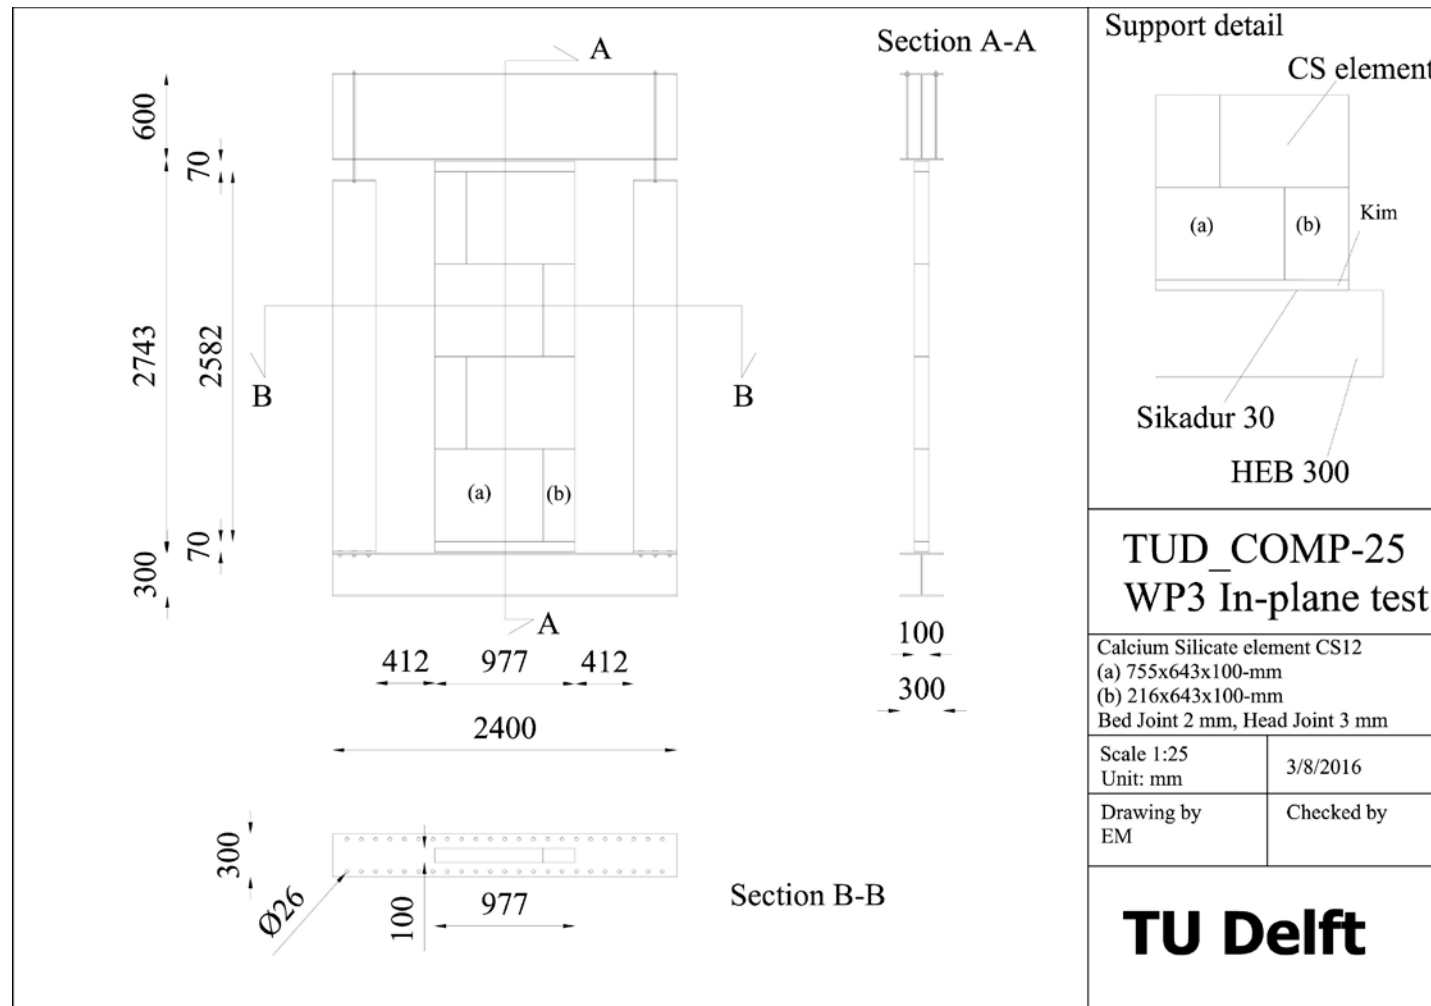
Drawing adopted for the construction of wall TUD_COMP-25. As built dimension in Table 19.
